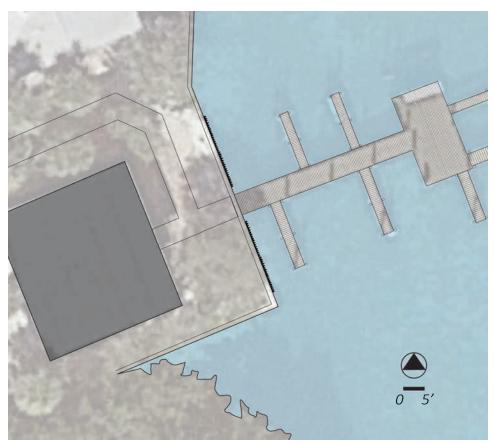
Site plan for the Englewood installation. Panels were installed over an existing concrete seawall.
